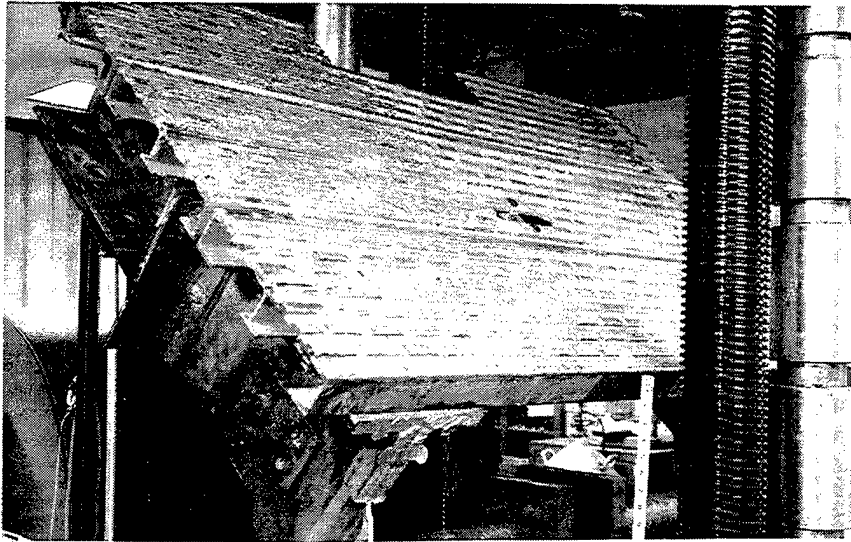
A large section of the AVLB deck in position on the testing machine. A large round steel bar was through the holes of the girder plates to attach the section to the test jig fastened to the crosshead of the testing machine. The section is positioned at a 45° angle to the load axis. The lifting device (lifting steel bar) is in the oblong hole of the center deck panel.
